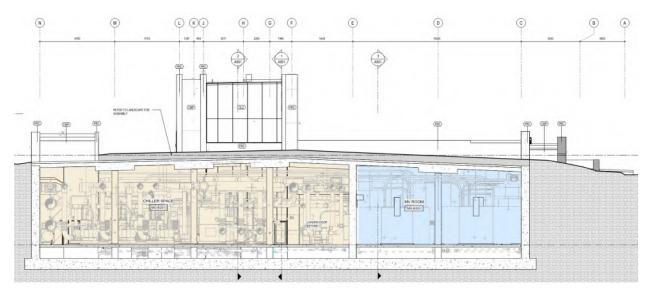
Plant Floor Plan – Mechanical (beige) and Electrical Rooms (blue)
